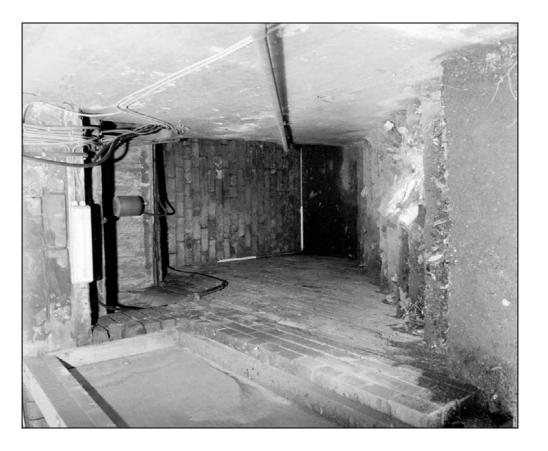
View down external staircase from central yard to B7 (film 8.6)
